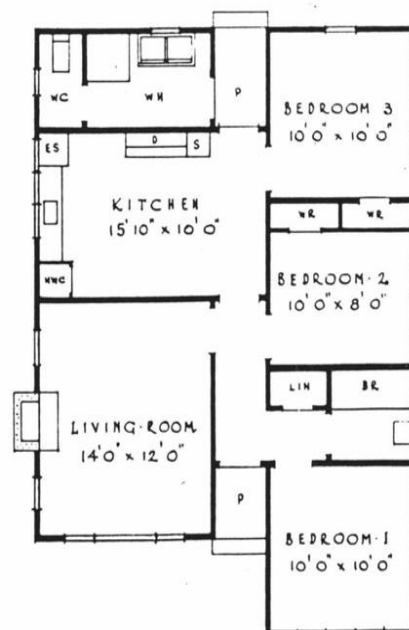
Department of Māori Affairs Design Advisory Service housing plan type 3/10
